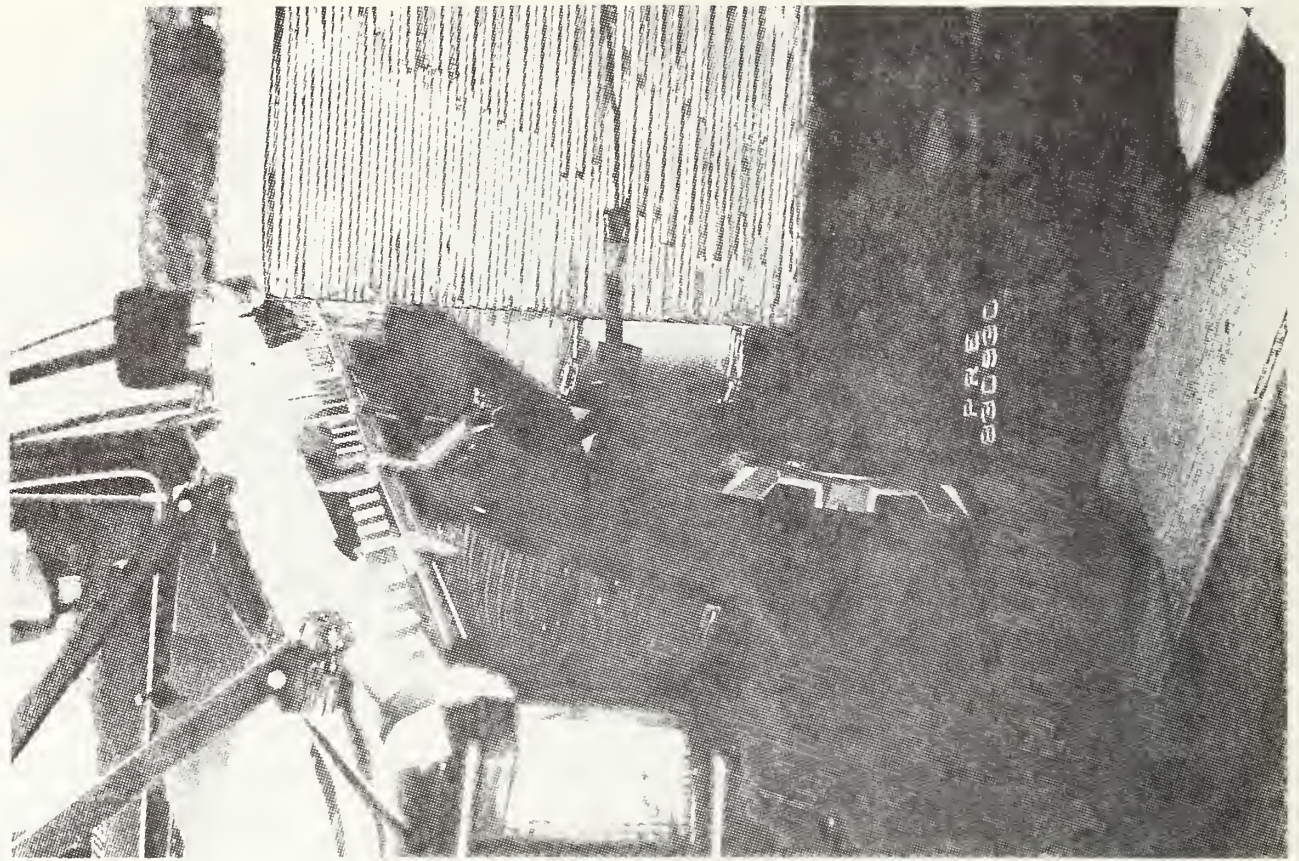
PRE-TEST CLOSEUP - VIEW 1
